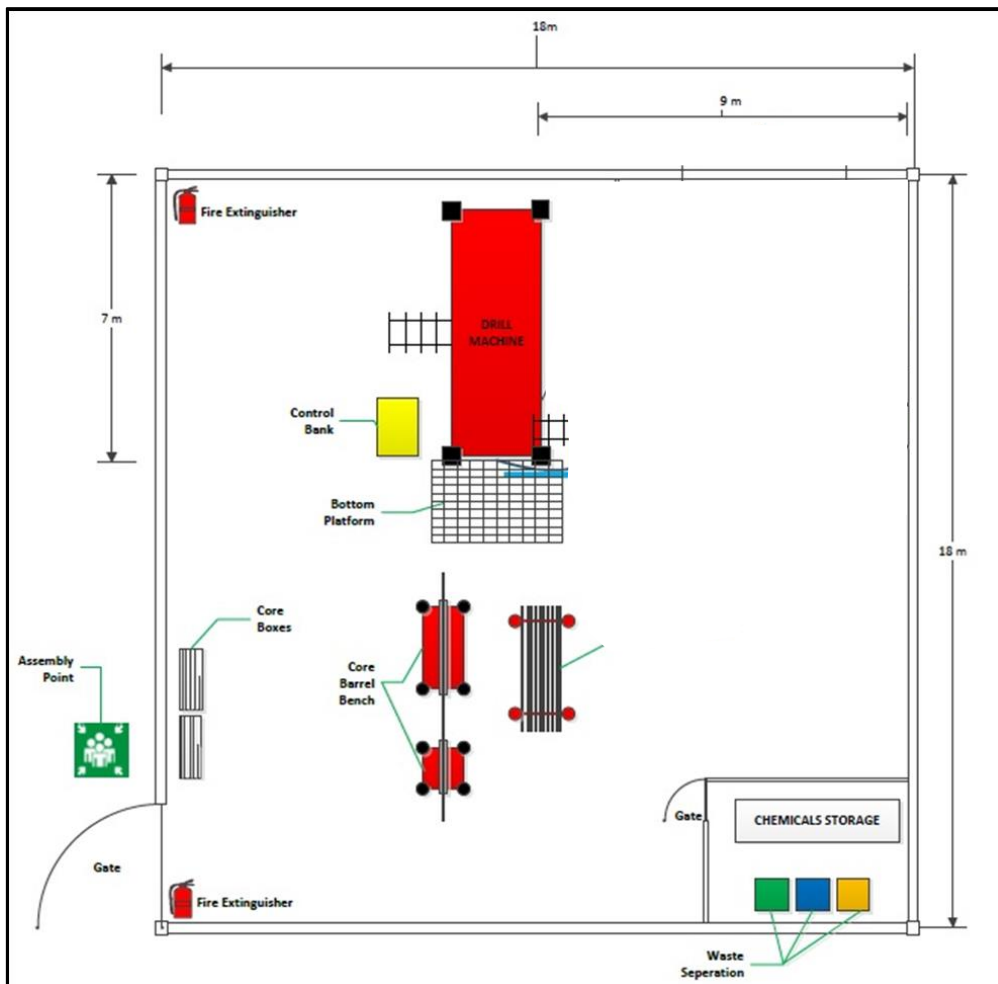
GENERAL LAYOUT OF A TYPICAL PROSPECTING SITE
